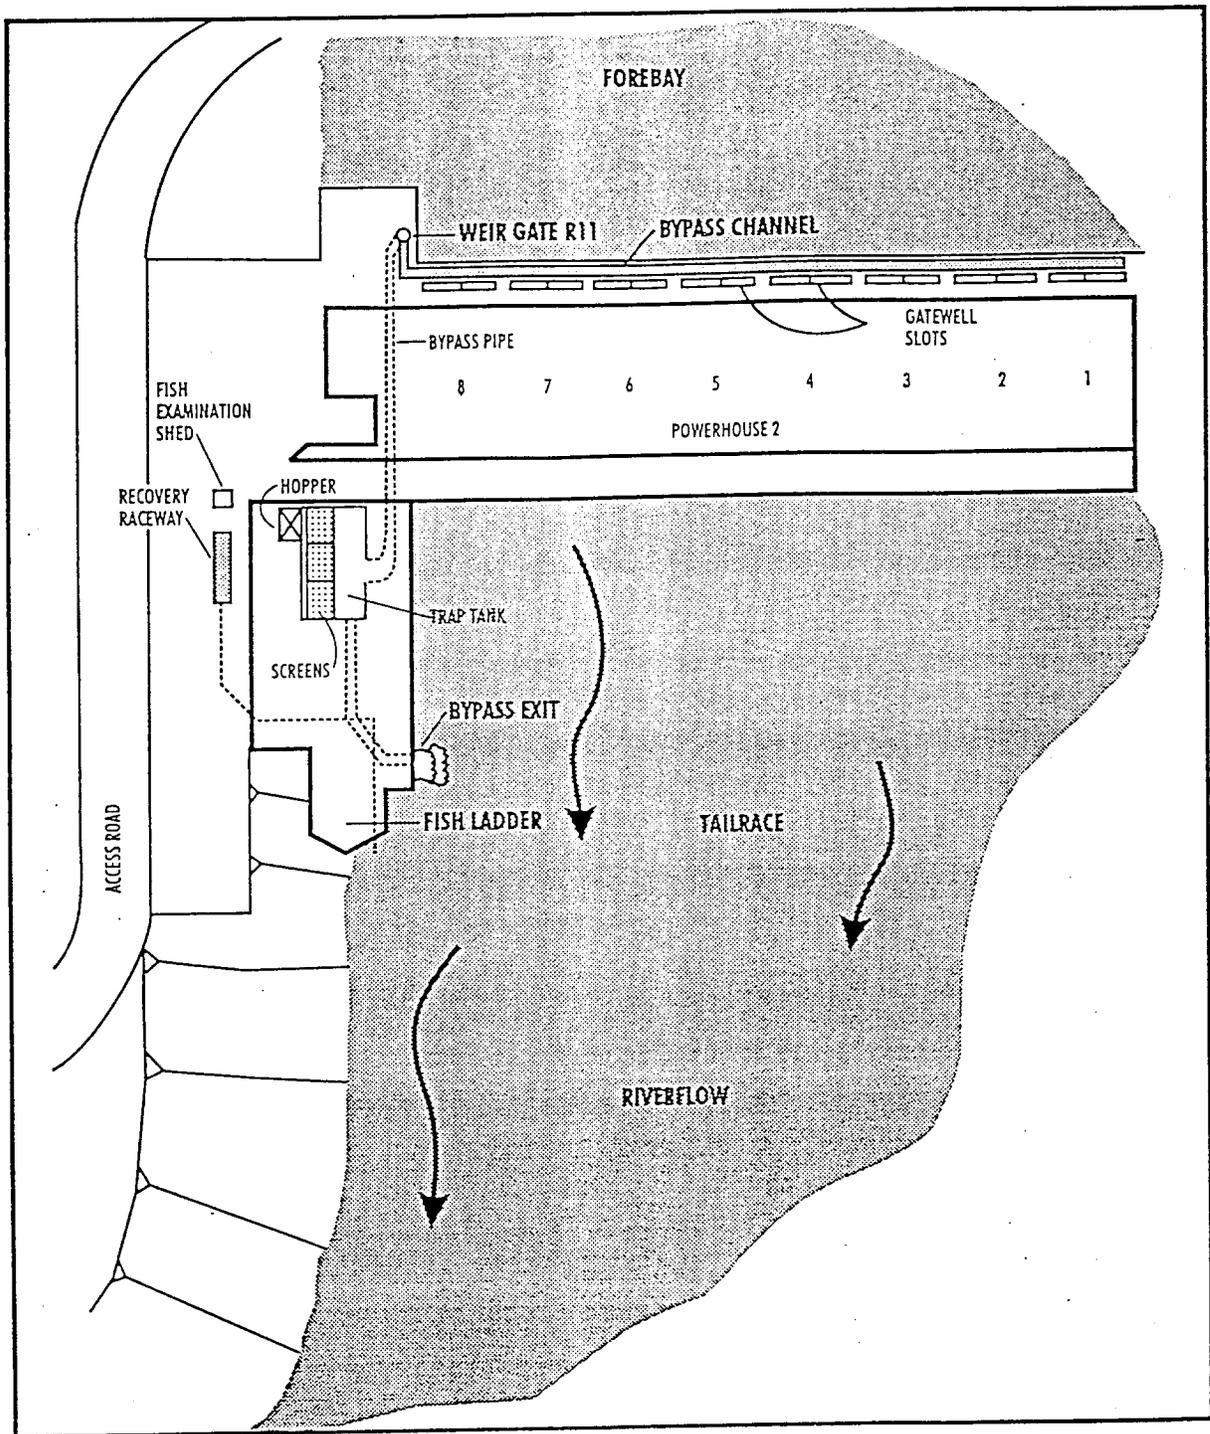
Plan view of juvenile bypass system at Rock Island dam Powerhouse 2 (Source: Olson 1983).
